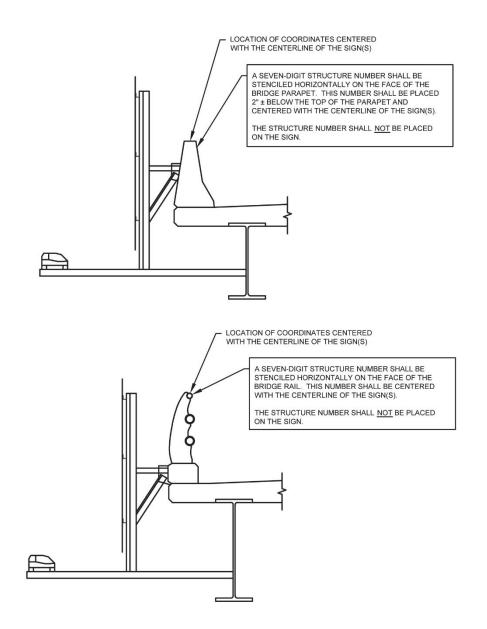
Bridge Parapet Mount Sign Structure, Number and GPS Locations
